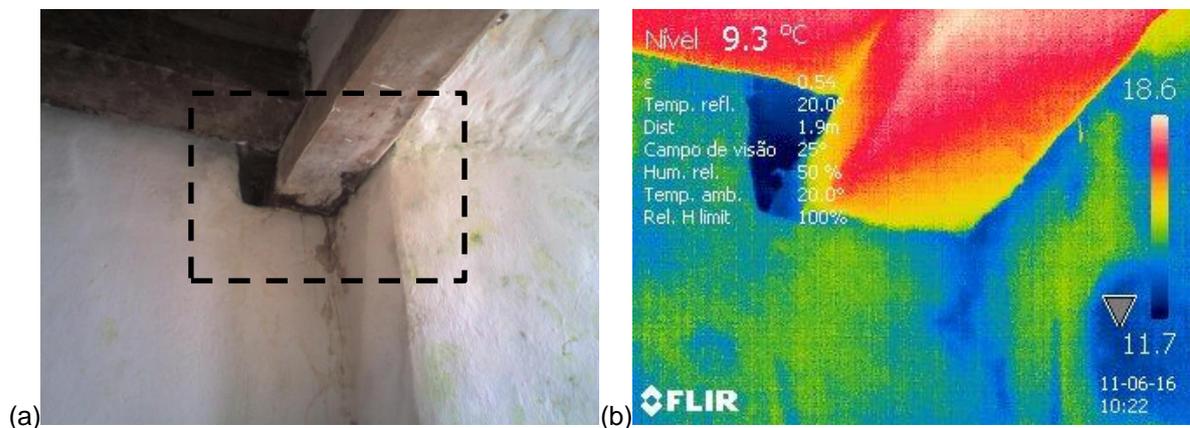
Moisture surrounding timber structural supports with serious dampness in the wall pocket
